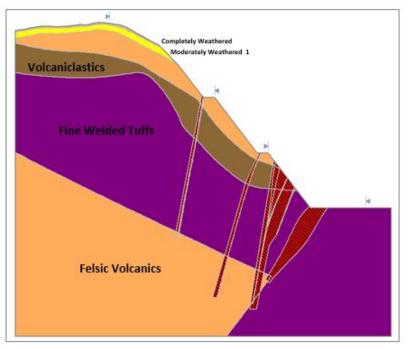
Geotechnical Design Section 4: *Slide2* cross section
